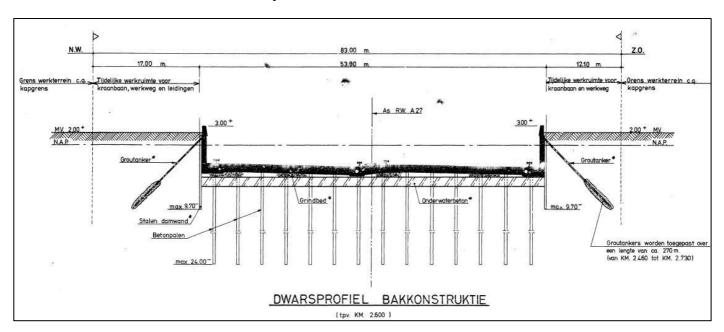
Cross section of the current structure at Amelisweerd [6].
